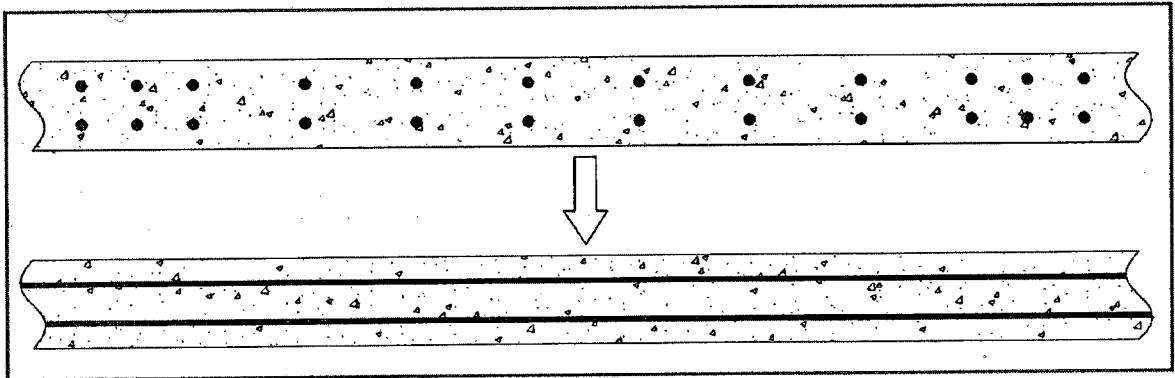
Modeling of steel reinforcement using SAP2000 layered shell element (Sipple, 2008).
